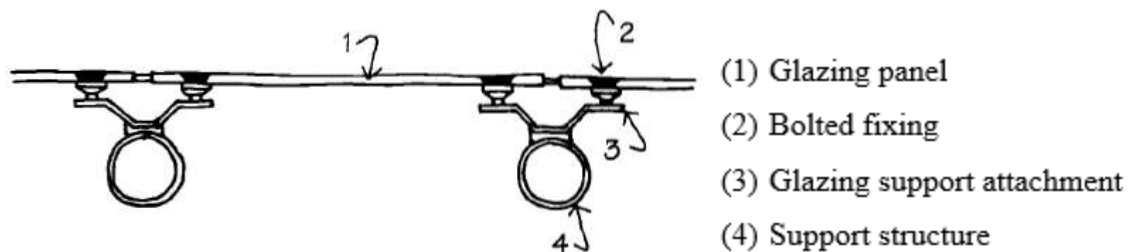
Frameless glazing system (Ryan et al., 1997)
